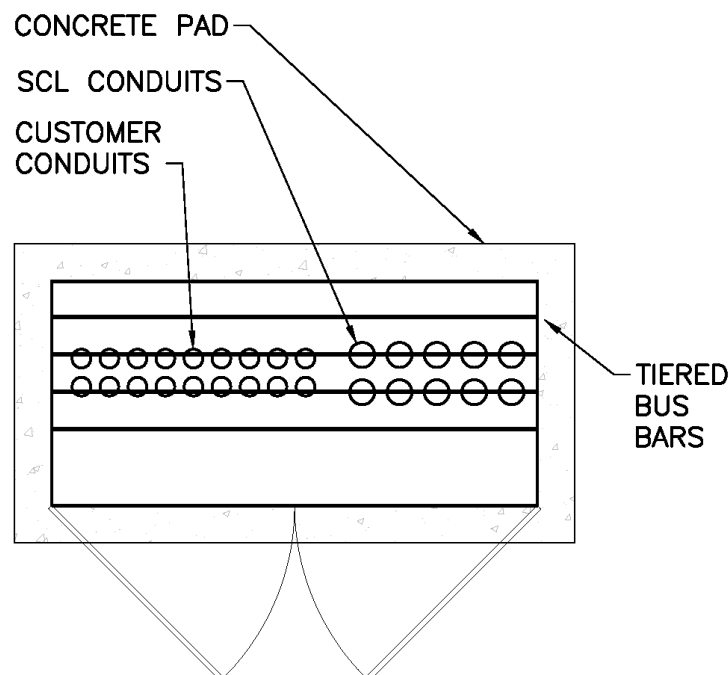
Tiered Bus Bar Conduit Arrangement
